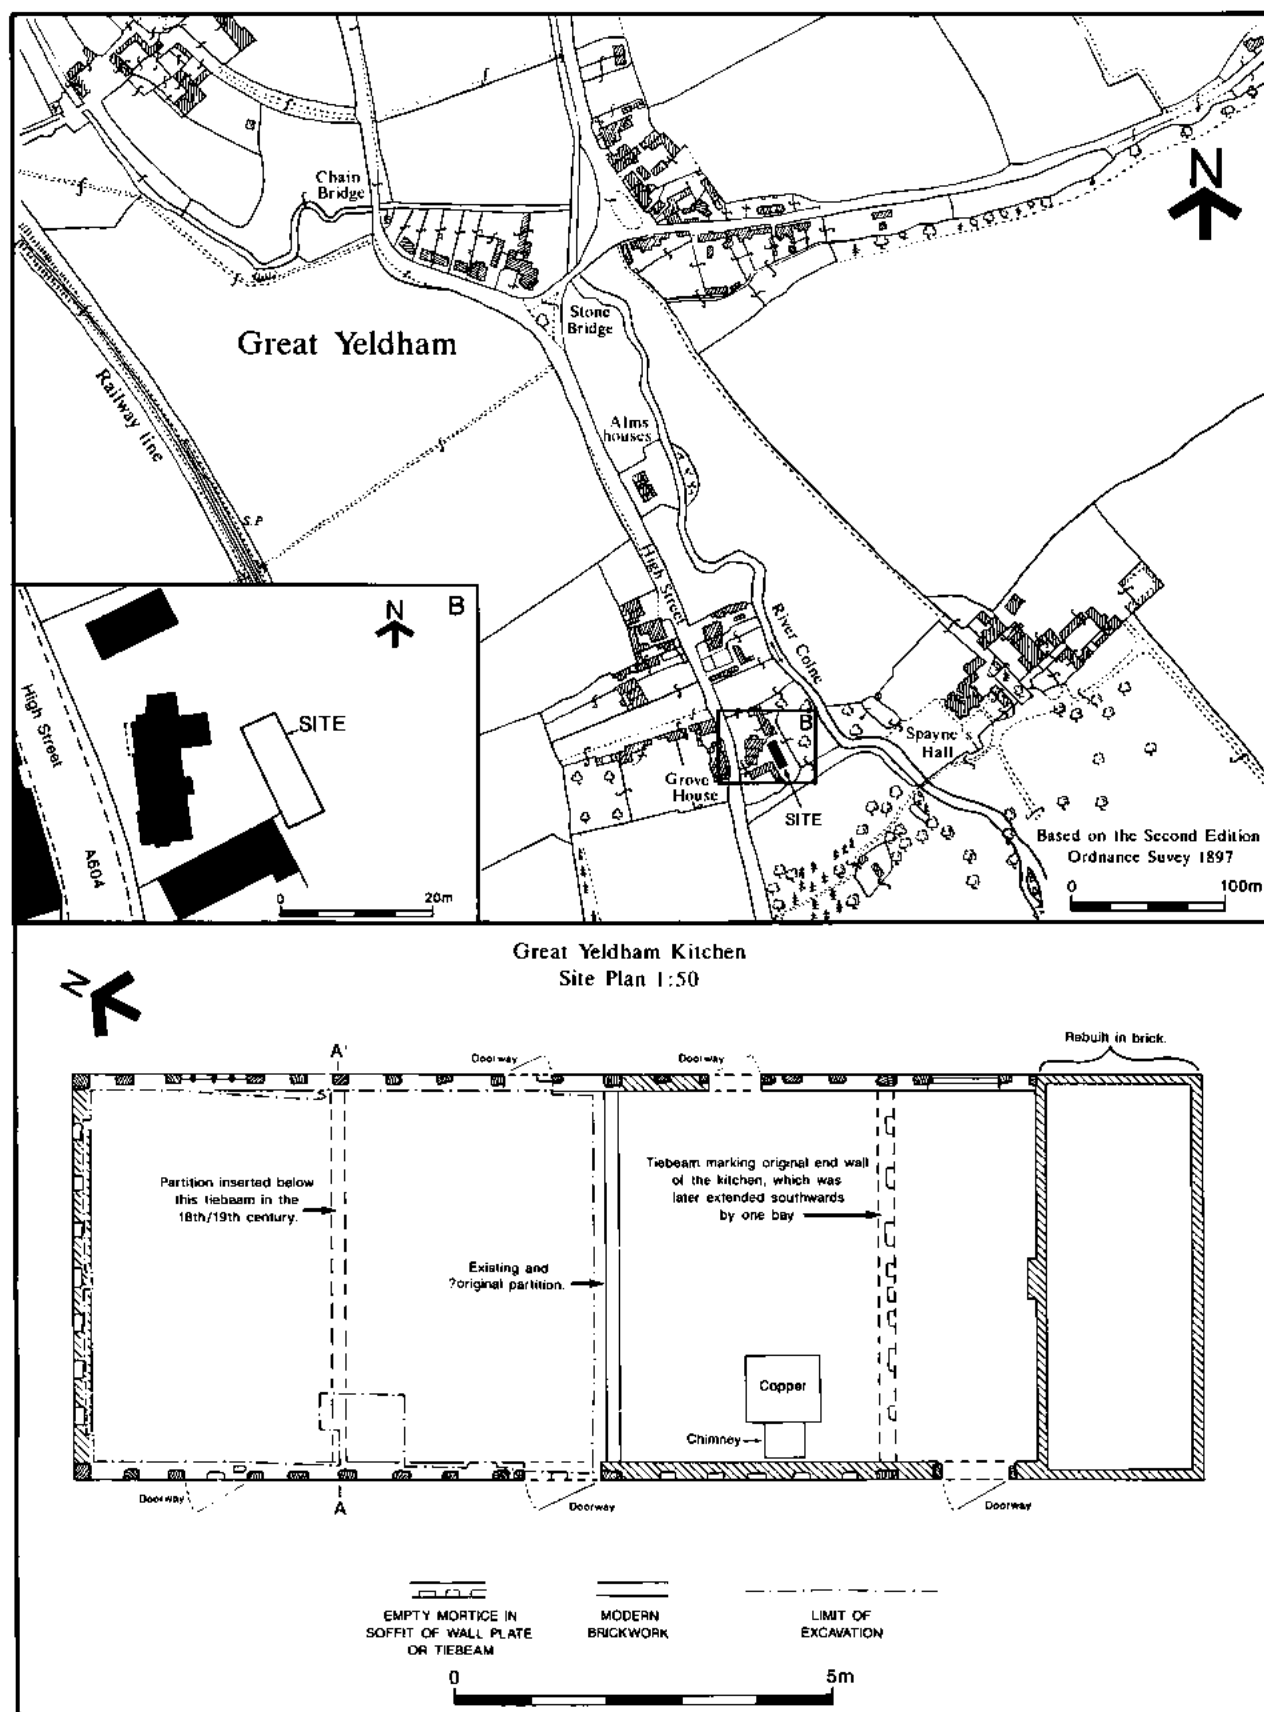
Great Yeldham. General site location (above); plan of detached kitchen (below).
